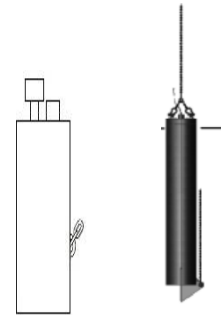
Suction anchor (left) and SEPLA [8, 10]
